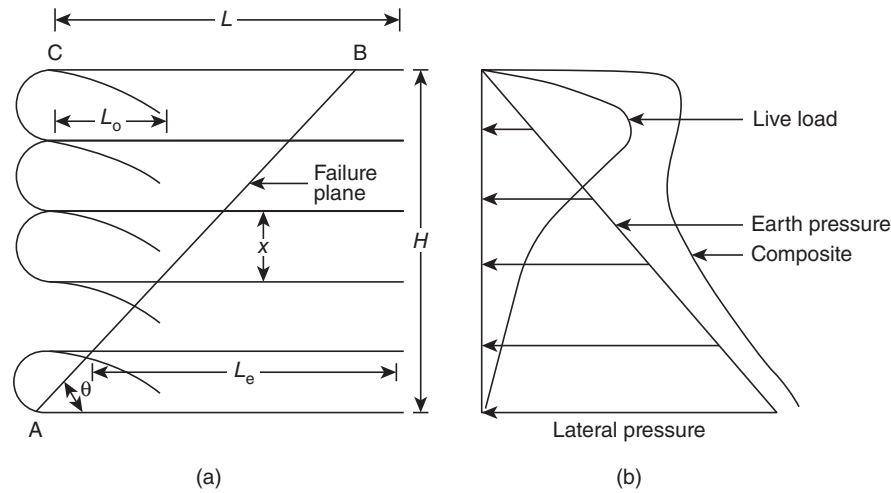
Geotextile-reinforced soil wall: (a) Backfill and (b) lateral pressure.
